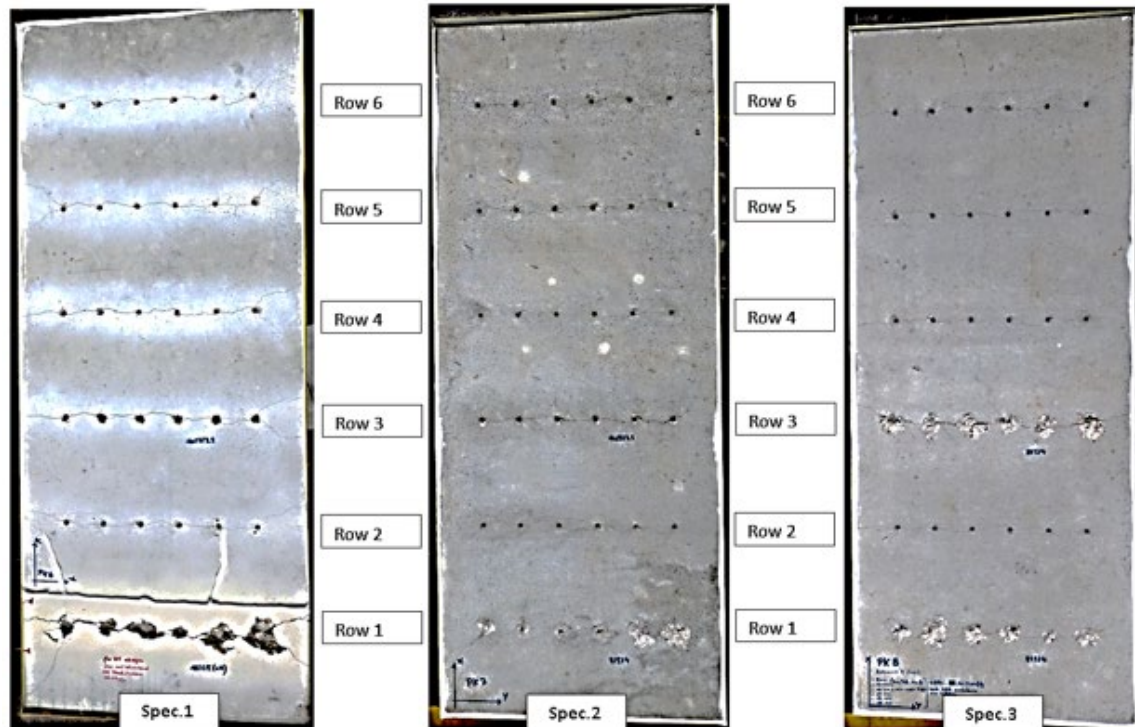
Photo. Concrete spalling after expandable material was filled into the surface level.
